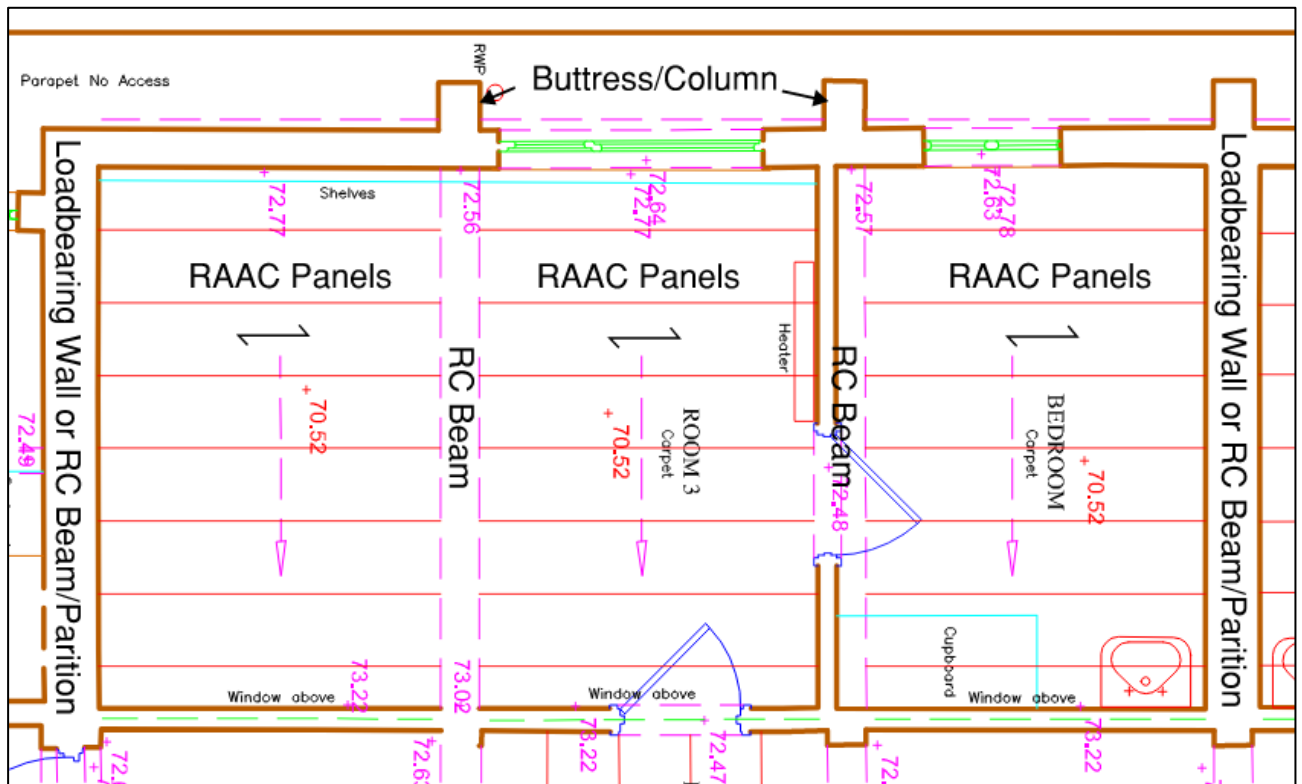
Typical Roof Structure Arrangement for Bedrooms (James Brennan Associates)
